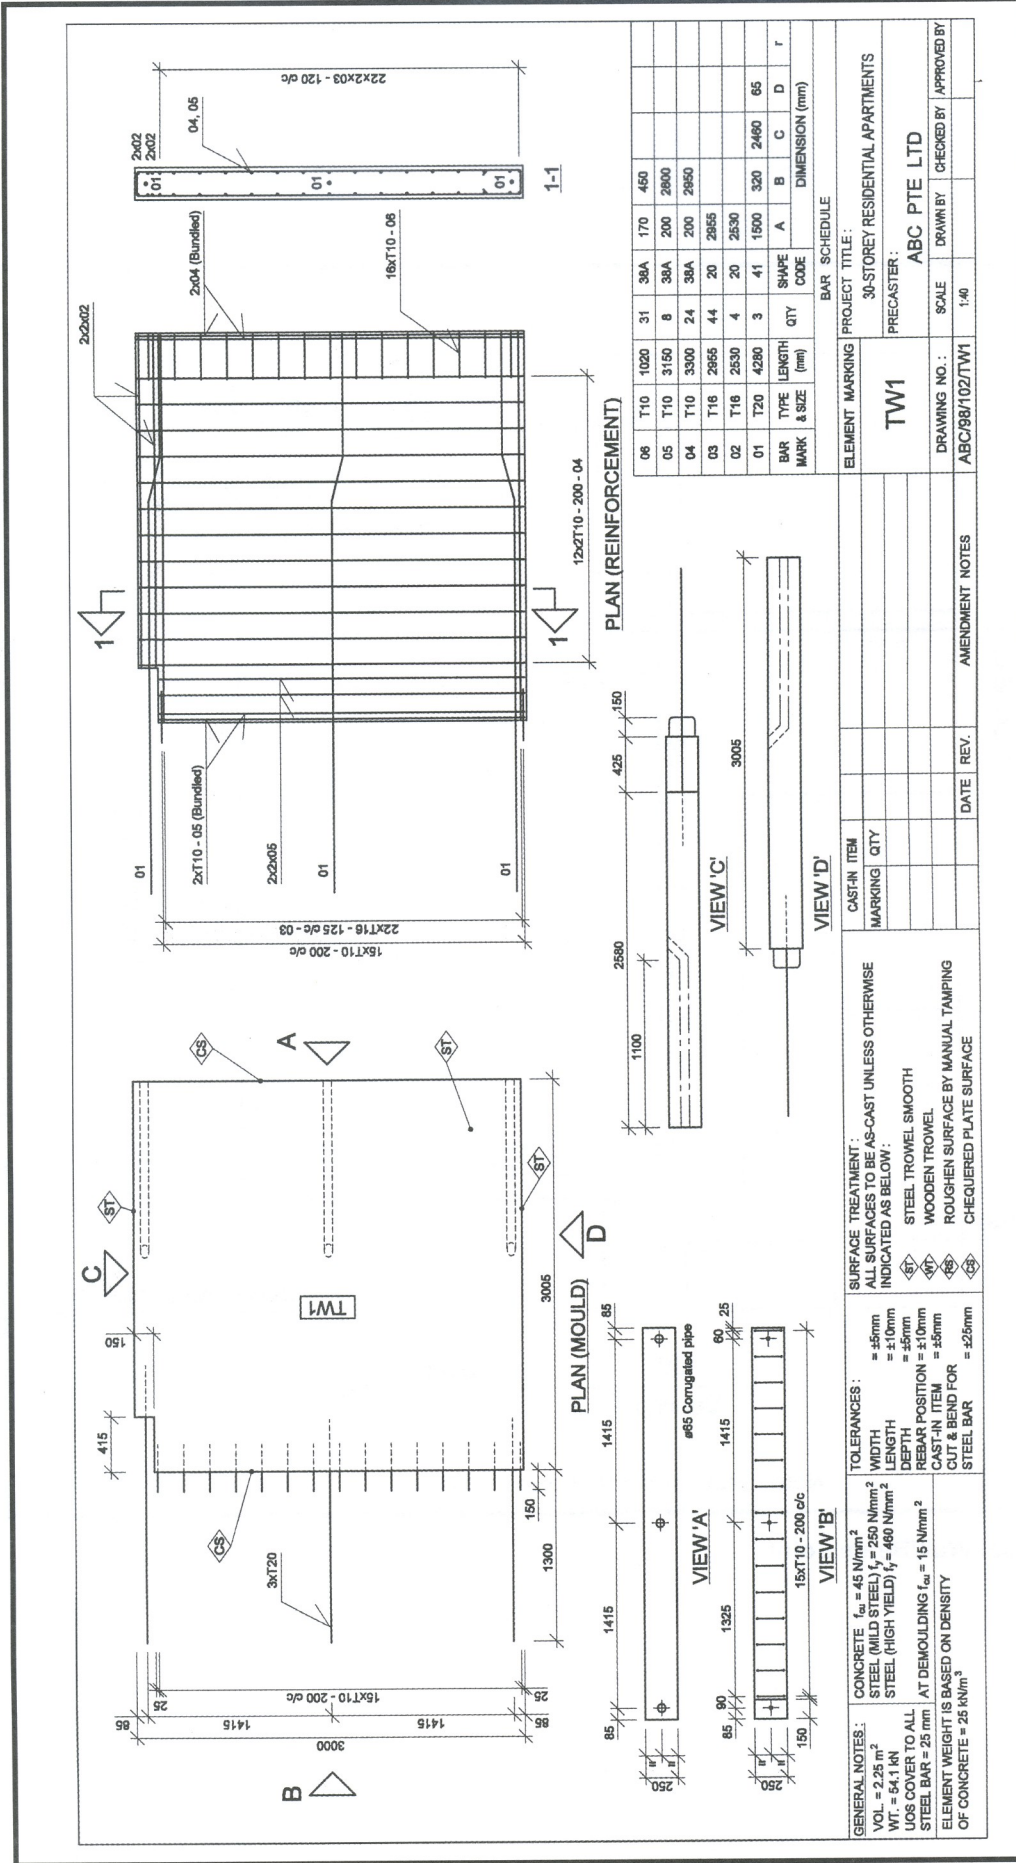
Mould And Reinforcement Details Of Precast Wall (Residential Block)
